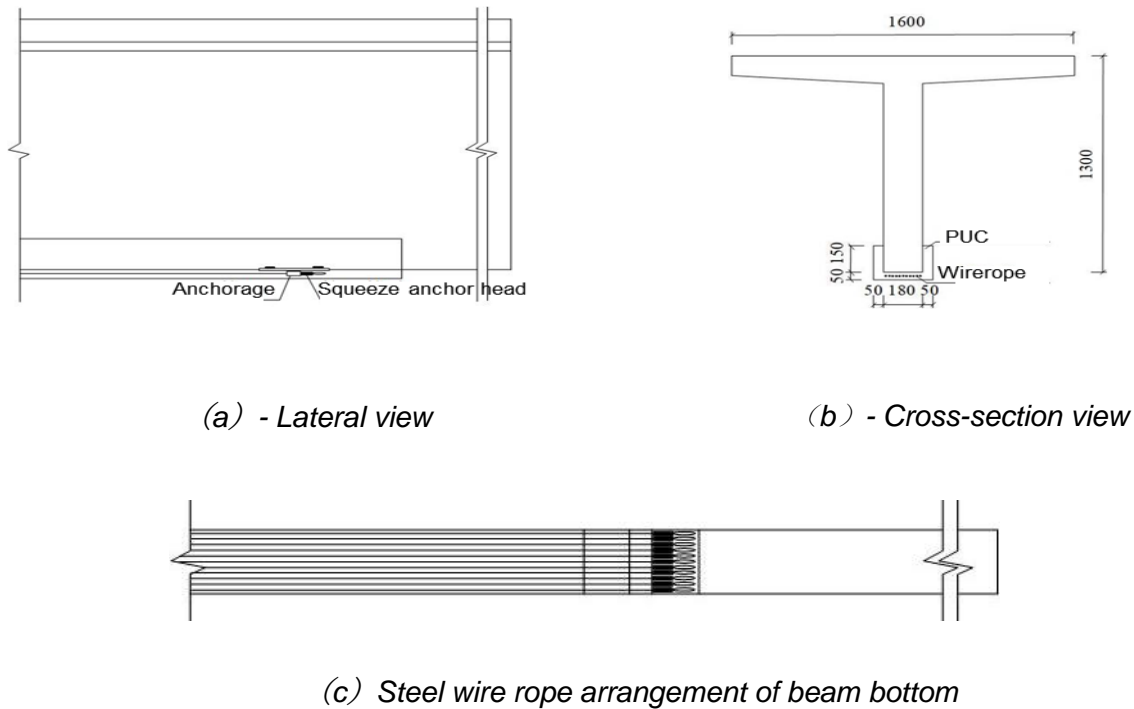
Lateral view, cross-section view and steel wire rope arrangement view of bridge one (Unit:mm)
